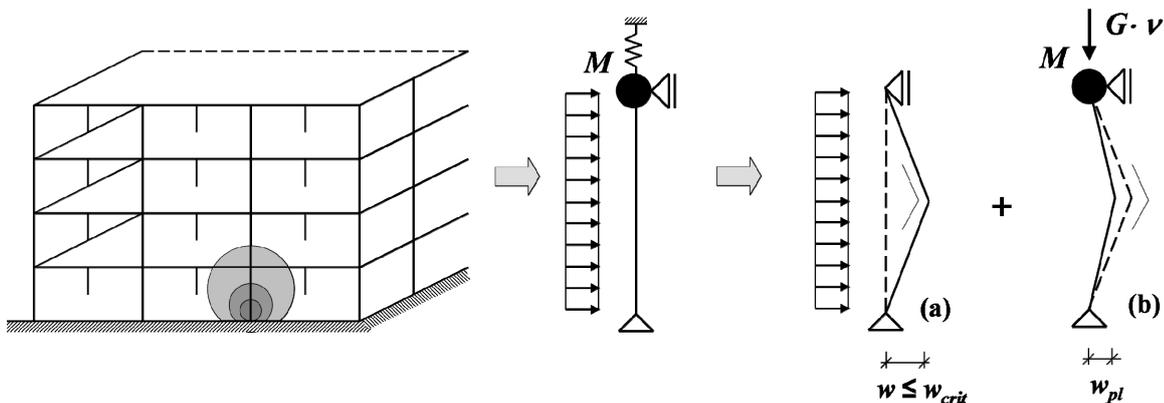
Design of structural member during (a) and after exceptional loading (b).
